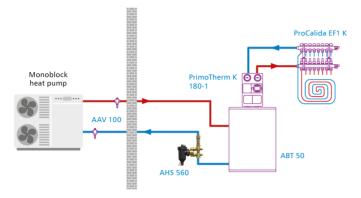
Example installation diagram with heat pump service assembly AHS 560
